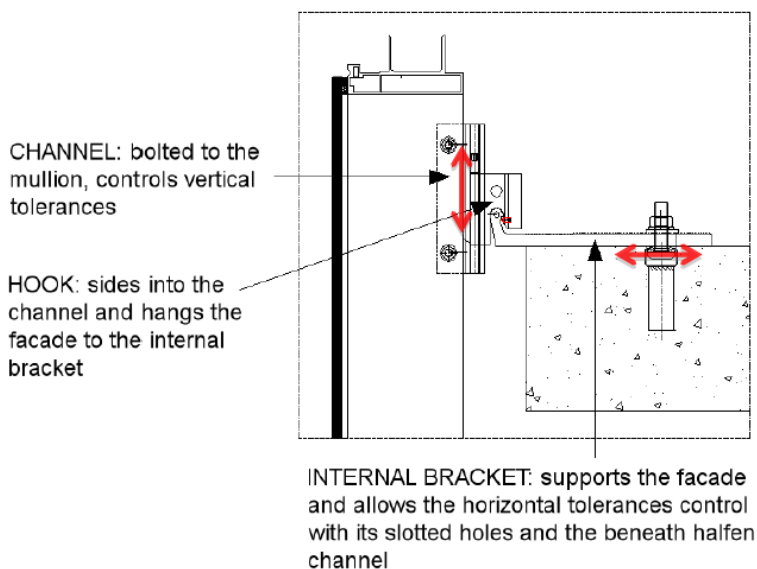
Horizontal section of the façade in correspondence of the fastening system (Umberto GALLI, 2011)
